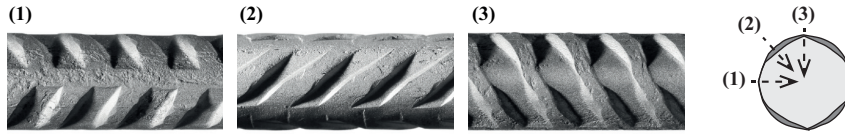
Details of the reinforcement ($d_b = 10$ mm) used for the straight (SB6, SB7), hooked (SB2, SB11, SB13, SB14) and U-shaped (SB10, SB15) bars made of deformed steel
